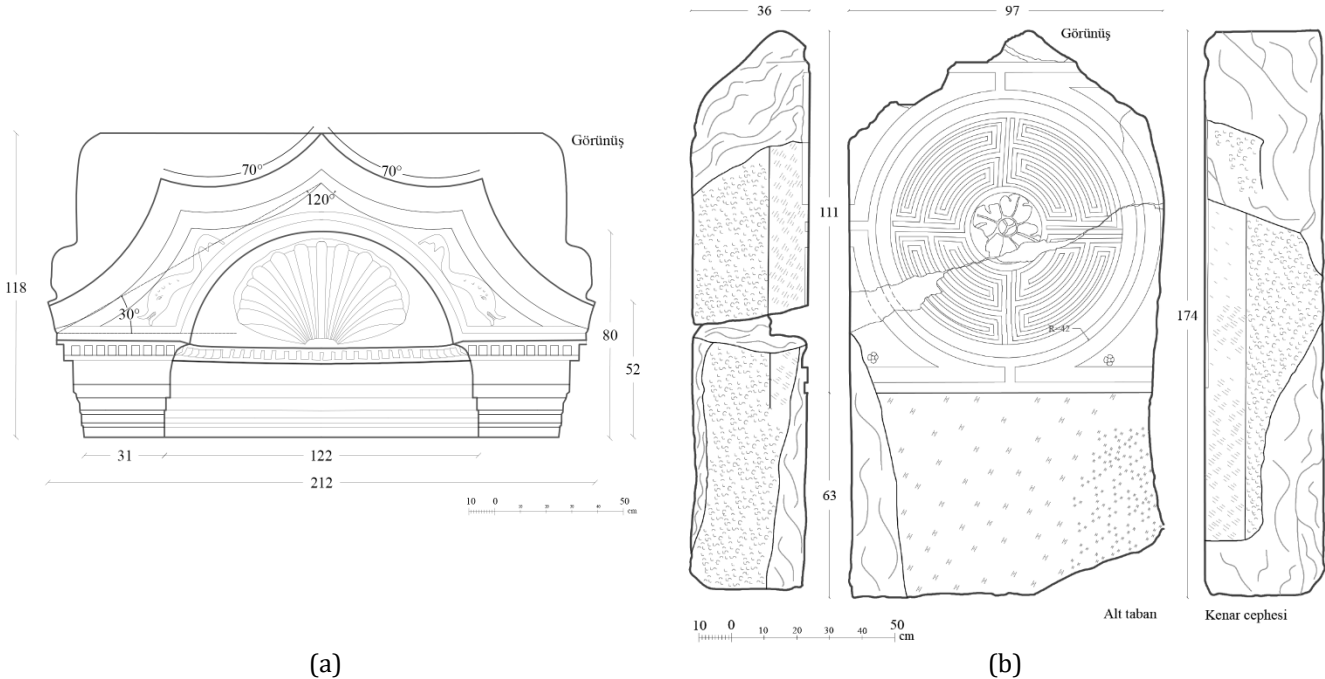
Building element drawings prepared on laser scanning outputs and completed with traditional technical drawing methods
